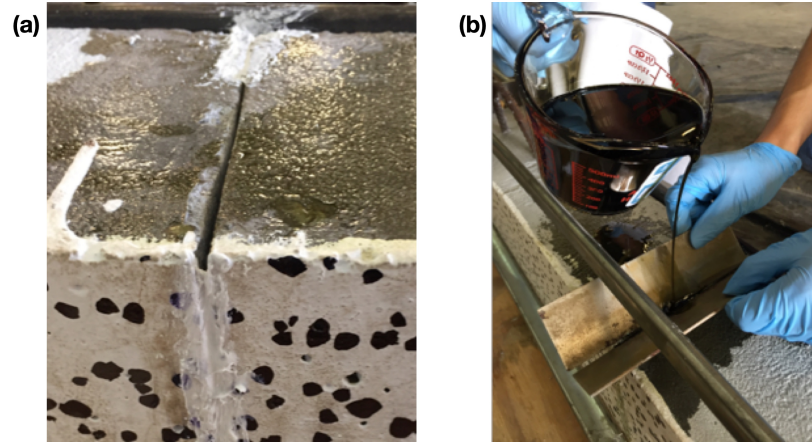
Preparation of epoxy-repaired beam: (a) "crack" opening of the repaired concrete beam; (b) pouring epoxy into "crack"
